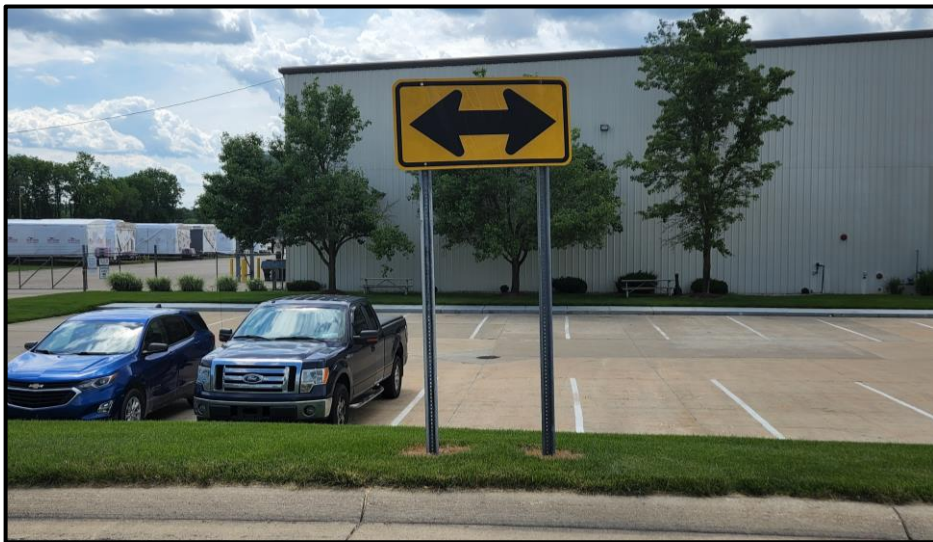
Intersection of Industrial Parkway and Deal Parkway, facing southeast. Existing vegetation, structures, and topography.
